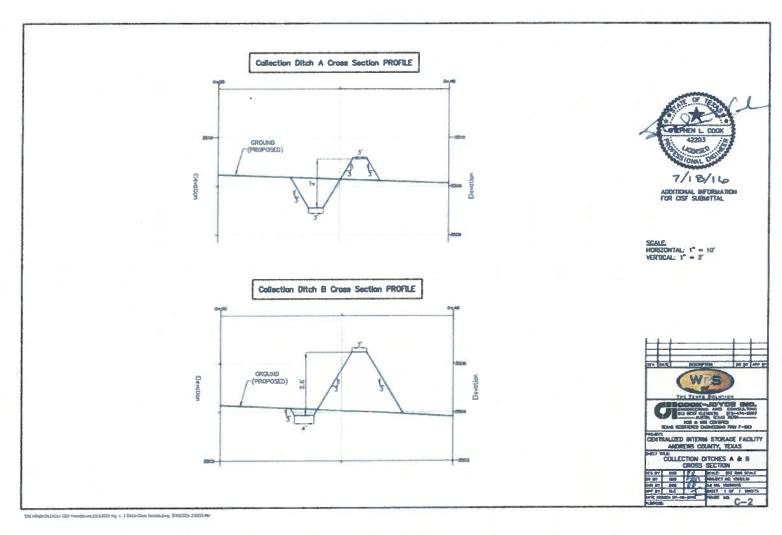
CJI C-2 Collection Ditches A &B Cross Section
